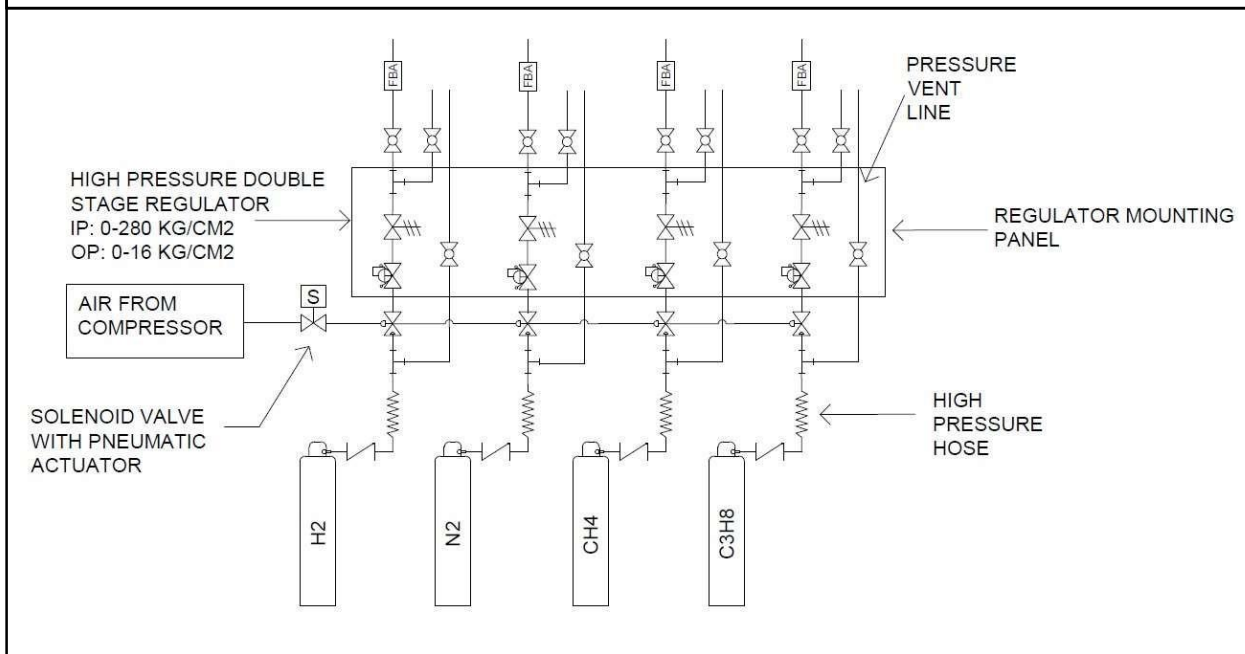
II - Pipeline from source to outlet (wall-mounted panel)
